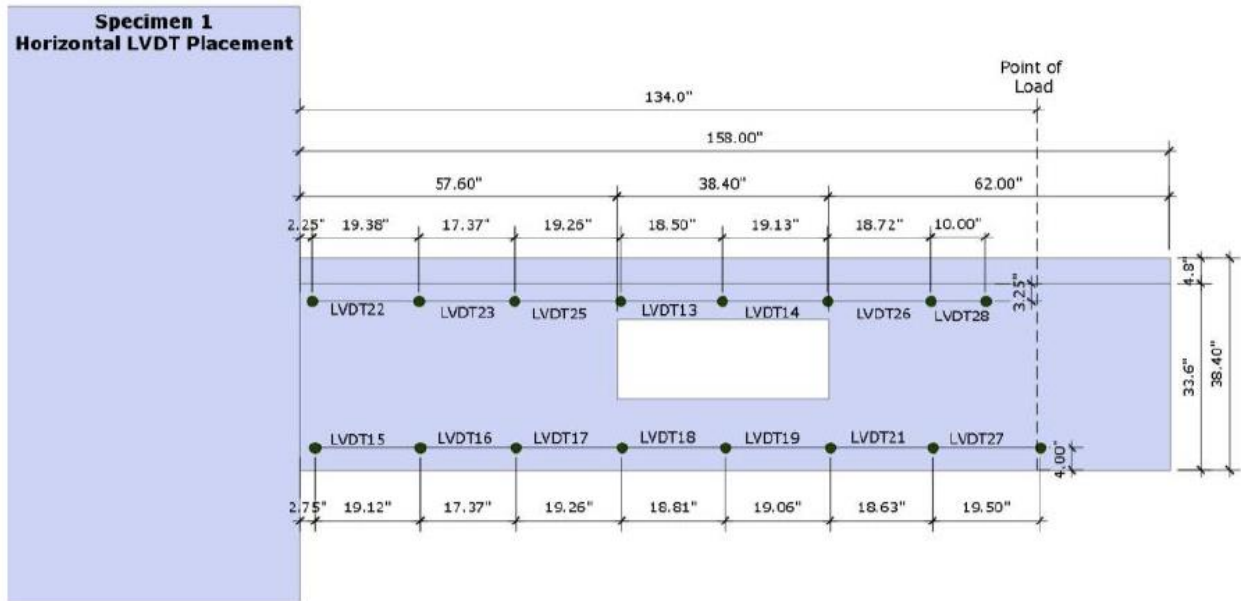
Layout of horizontal LVDTs on Specimen 1 (Lemnitzer et al., 2013).
